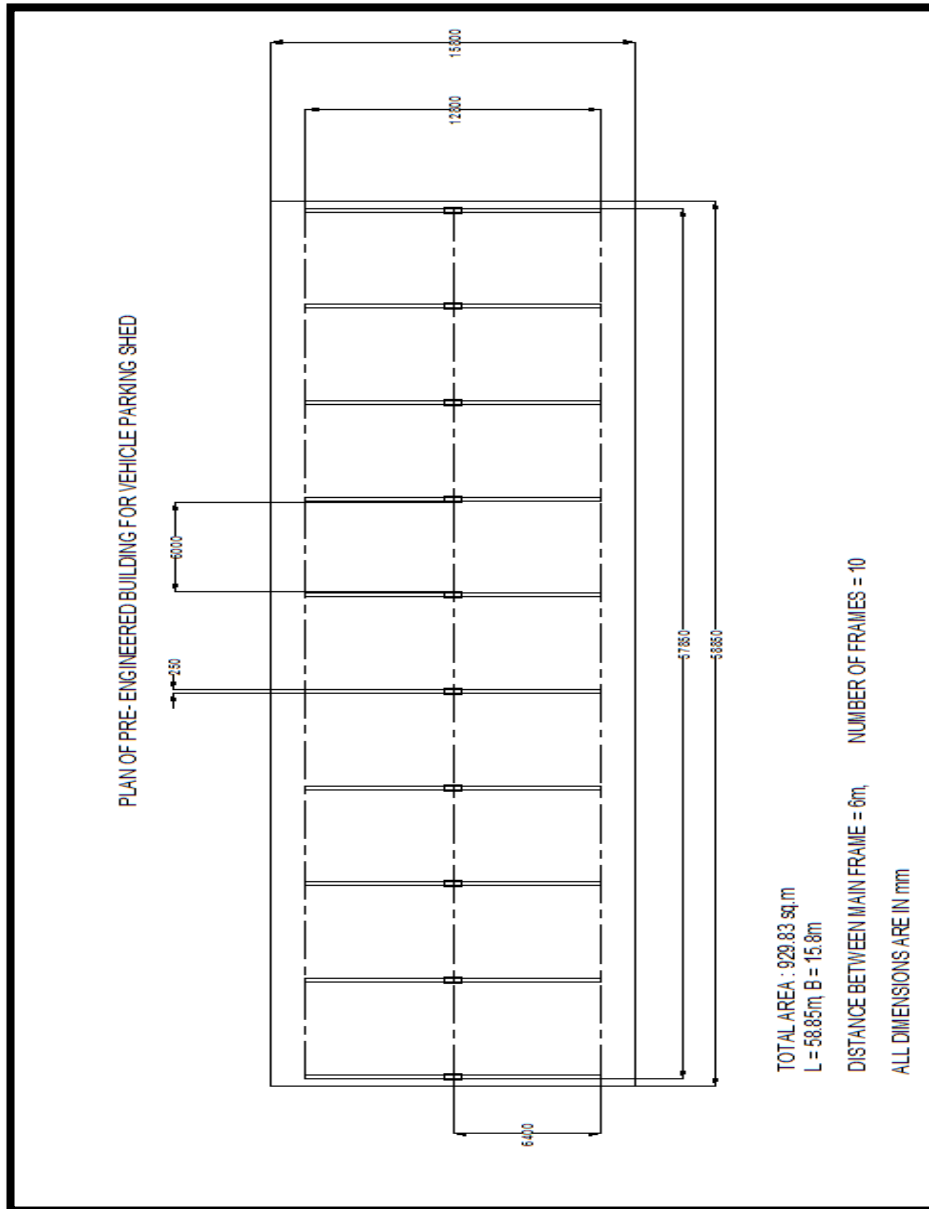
Plan of Pre Engineered Building for Vehicle Parking Shed
